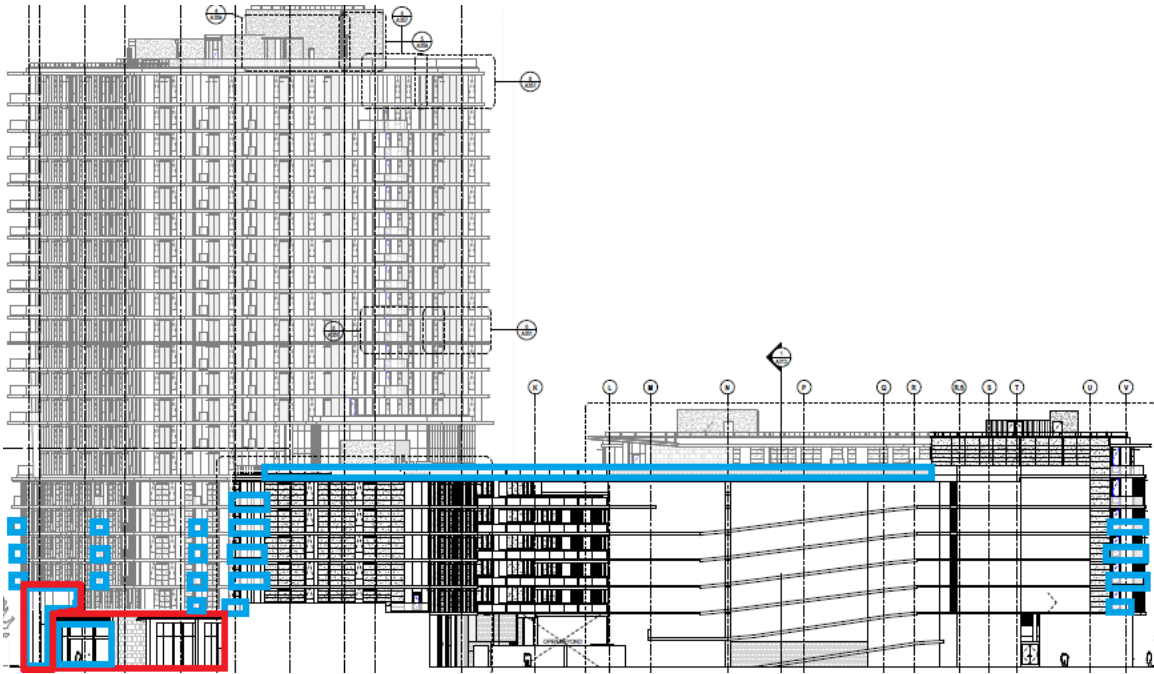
Extensive areas of glazing on Levels 1-2 of the west façade of the apartment tower (left) are indicated in red, and feature-related hazards (transparent glass railings and building corners) on the west façade of the apartment tower and mid-rise building (right) are indicated in blue.
